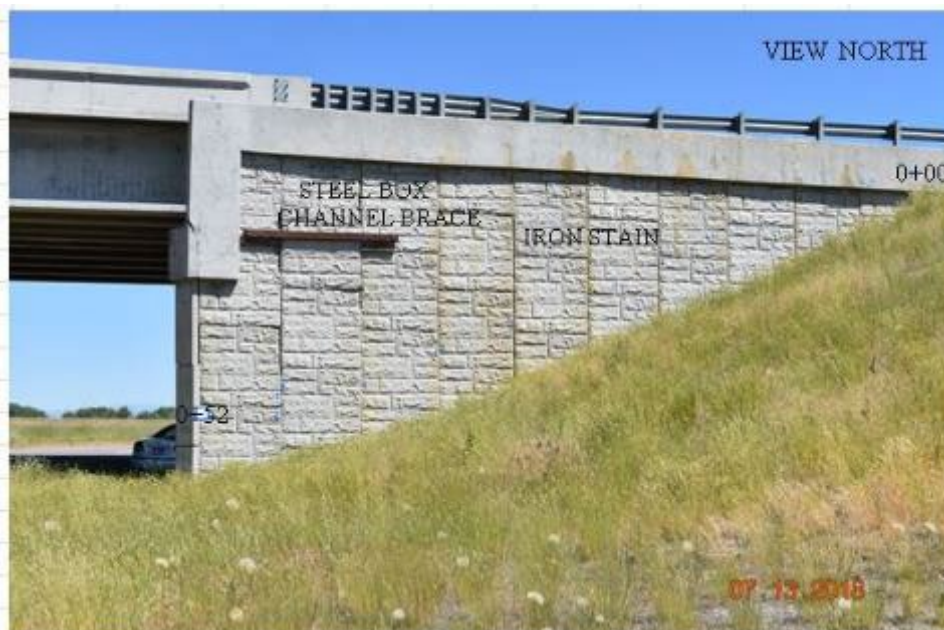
South MSE Wall, East Abutment of SH-33 Exit at US-20
